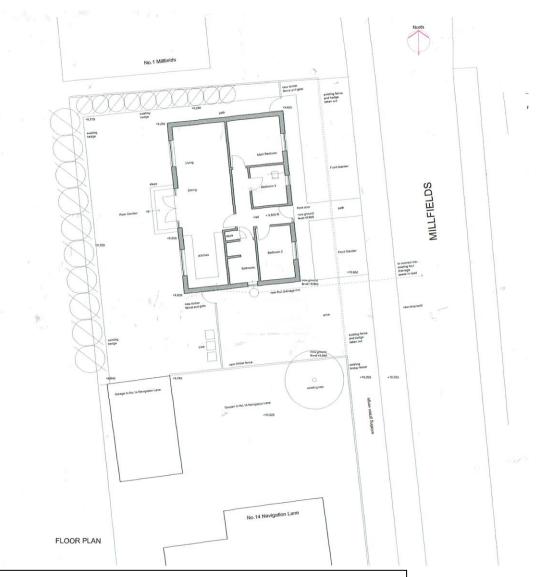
Block plan showing the proposed layout of the development site at a scale of 1:200 at A2, (extract from Architects plan)
